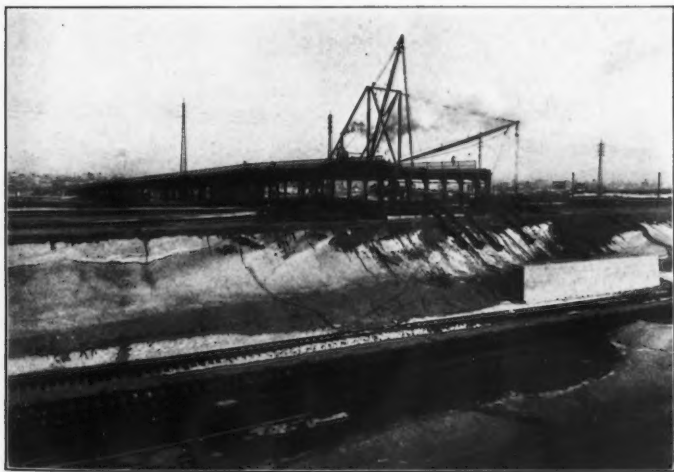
ERECTING SUPERSTRUCTURE, HONEYWELL ST. BRIDGE.
